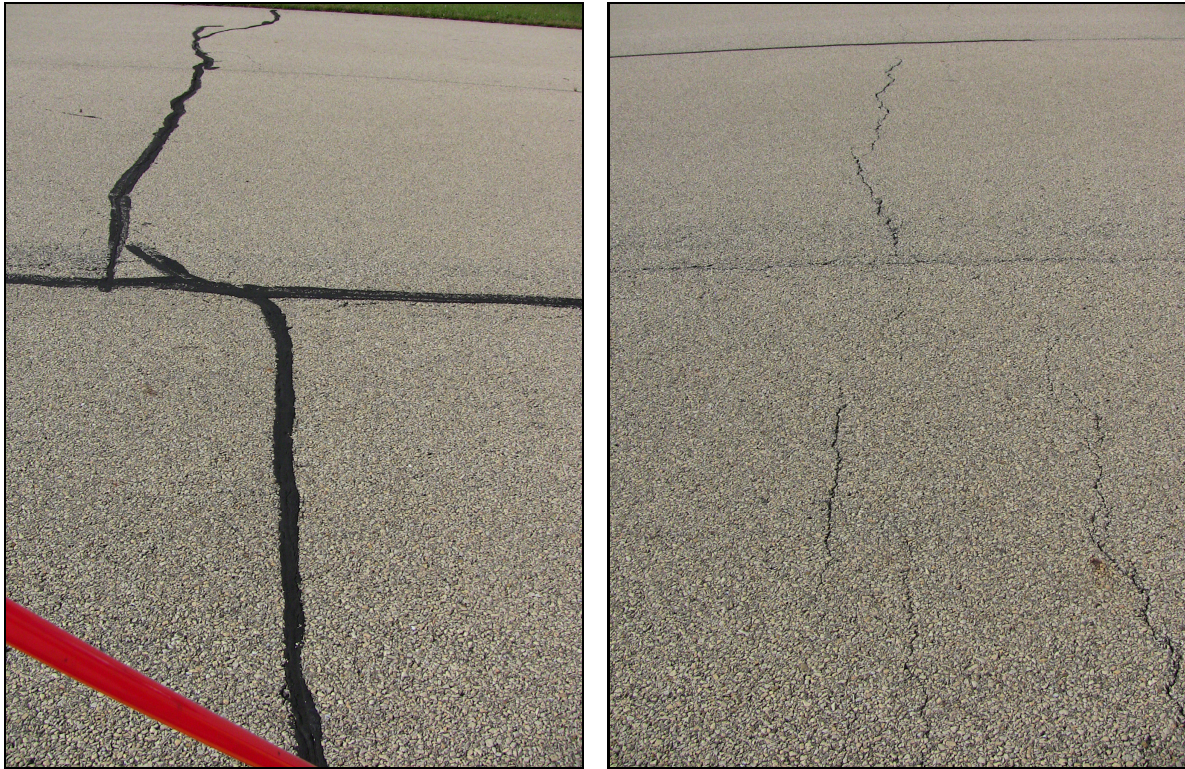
Typical Reflection Cracking in Treated Section after Nine Winters
